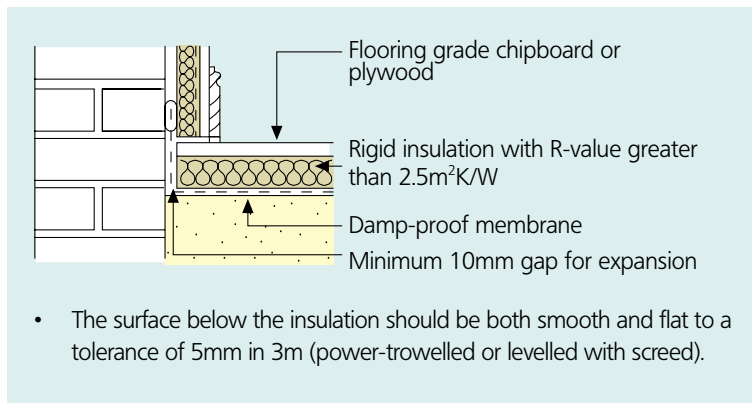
Concrete ground-bearing slab with insulation above slab
